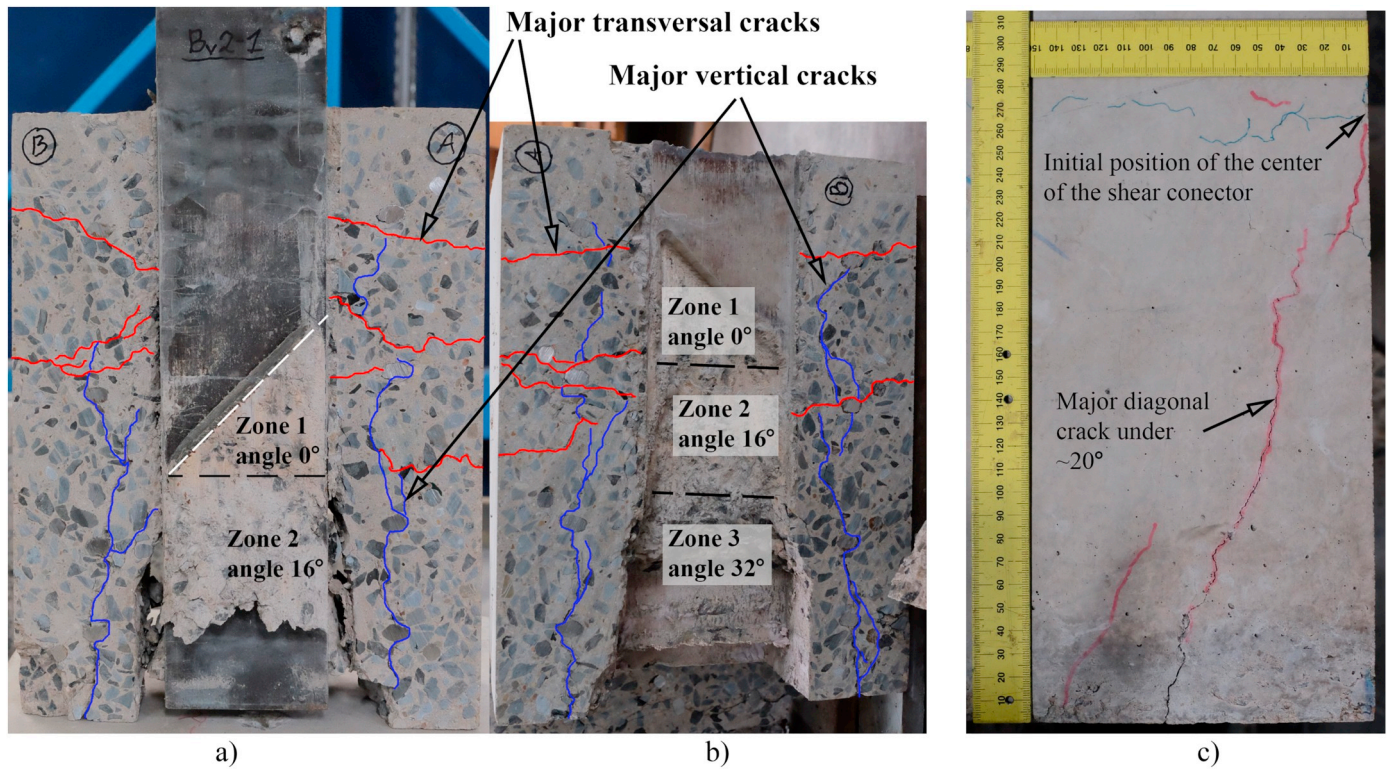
Opened specimen Bv2 – a) central part with steel profile, b) concrete encasement and c) cracks at the concrete surface (for the view reference see Fig. 10).
